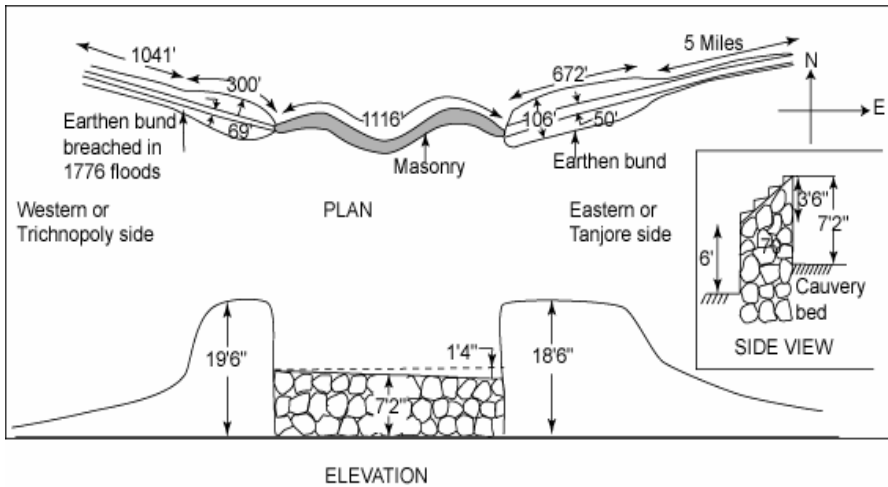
Plan and elevation of the Kallanai based on the 1777 report (not to scale)
